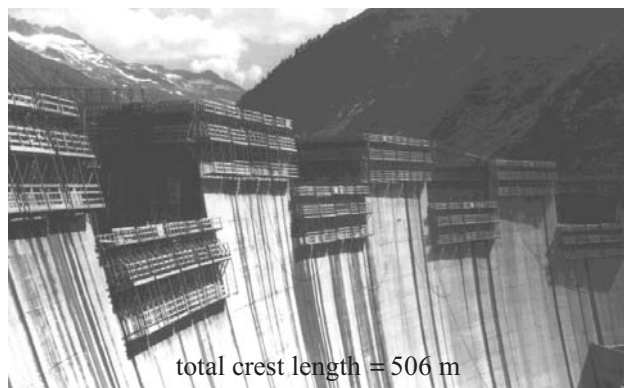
Zillergründl arch dam during construction 1984, Austria [91AUS].
